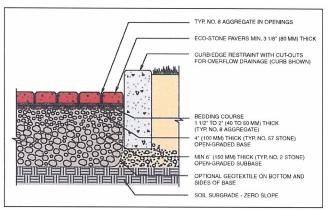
Typical Cross-Section of an Eco-Stone® Permeable Pavement Full Infiltration
